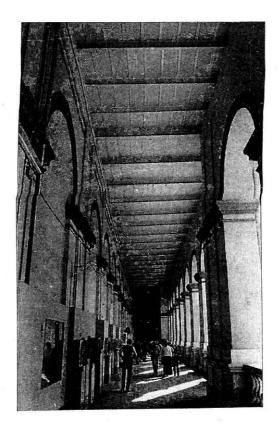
View of Corridor with Steel Section in Ceiling
